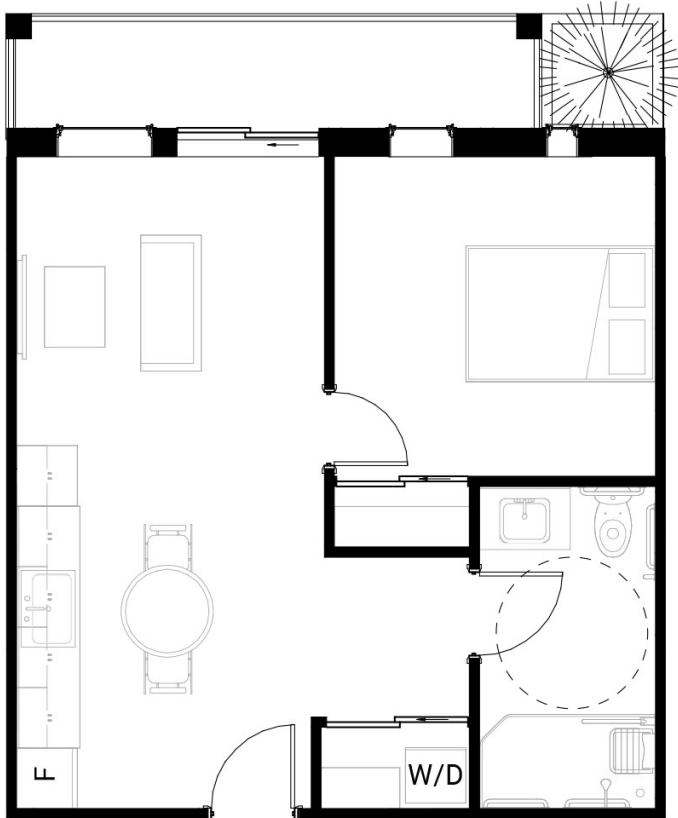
Unit Type 4 Floor Plan | Scale: 1:75.
